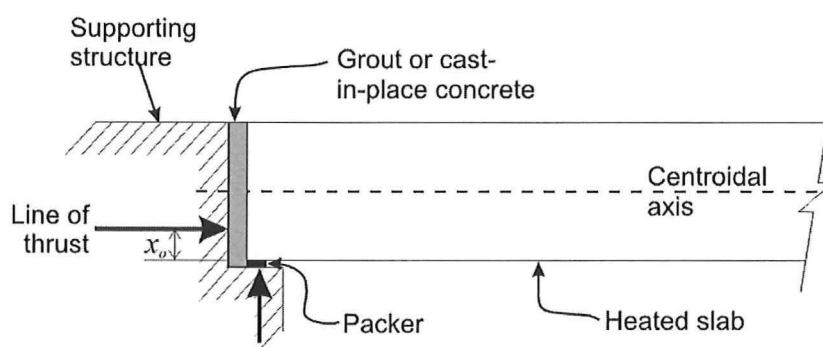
Precast slab with in-fill between the slab and the supports.
